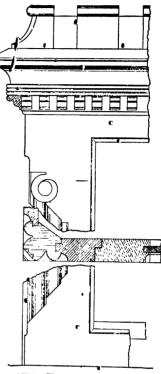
Elevation and Plan of Moulded Angle of Vestry Cupboard.
